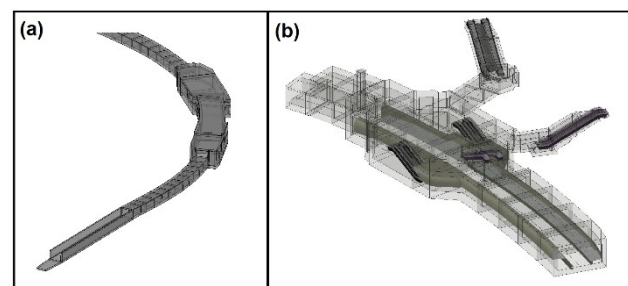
Examples of geometry models of the civil engineering department of Stuttgart for the subway station Börsenplatz with adjacent subway tunnels (a) and for the subway station Schlossplatz (b) (© Tiefbauamt Stuttgart, 2024).
